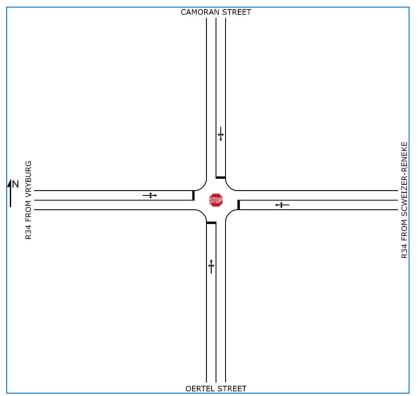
Existing Layout of R34, Oertel Street and Cameron Street - Intersection 3
